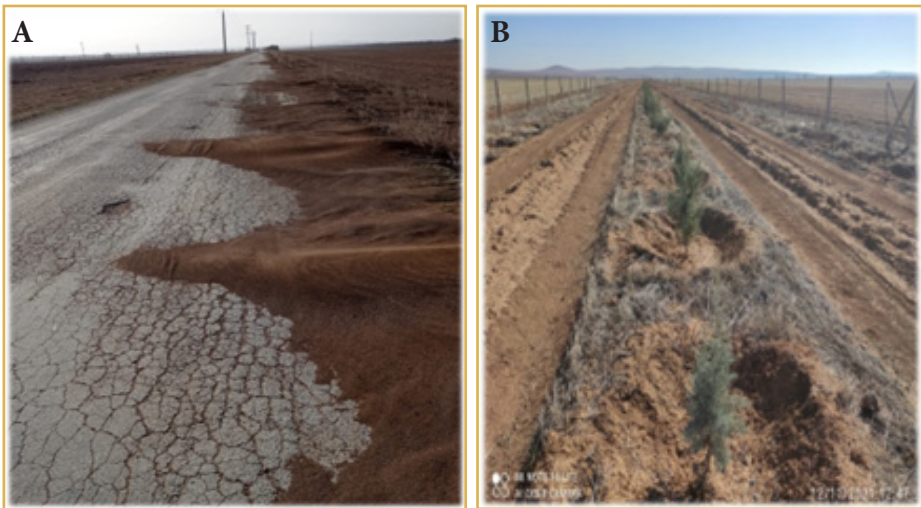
A: Soil Erosion Accumulated on Asphalt Road B: Saplings Planted for Live Wind Curtain
